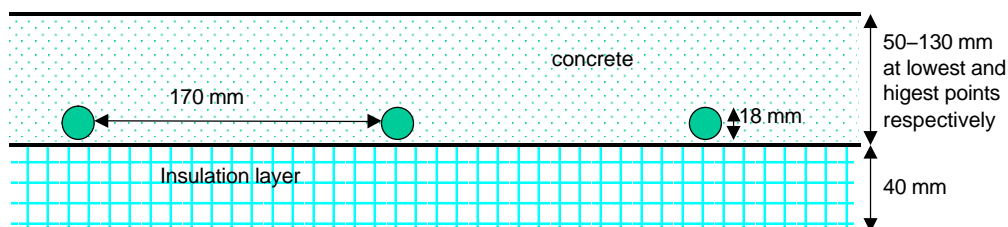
Cross-section of floor cooling with heat exchange pipes in room 2.
